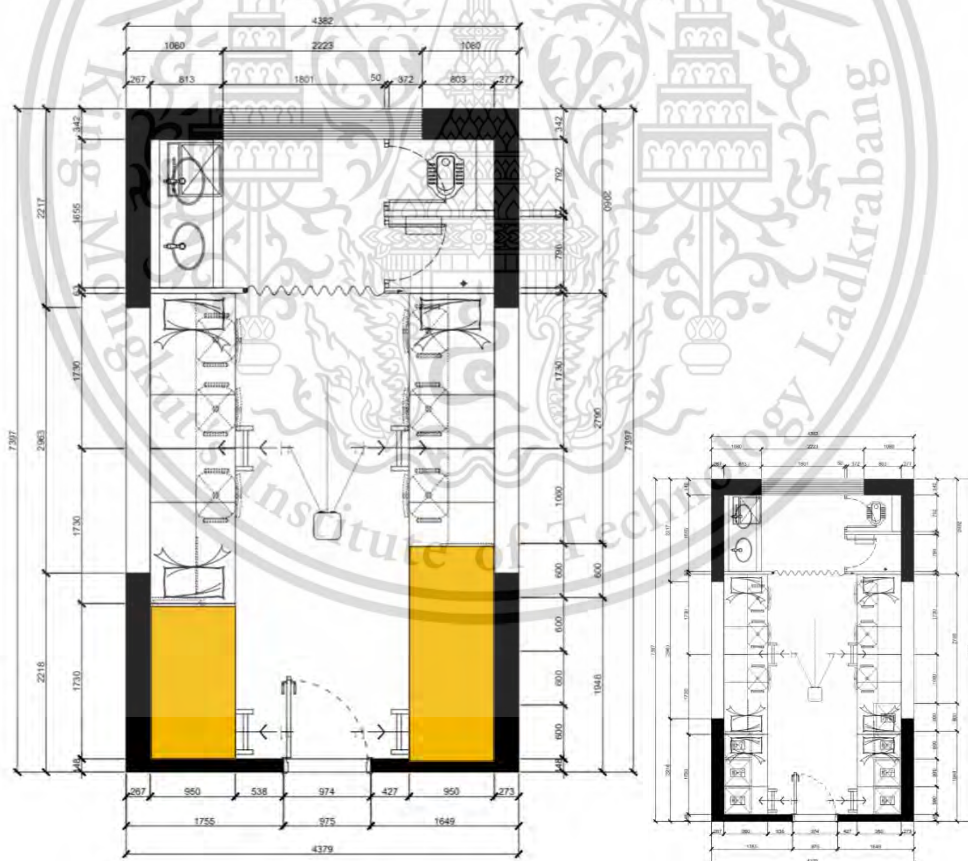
Collective Rental Space Floor Plan (self-work)
